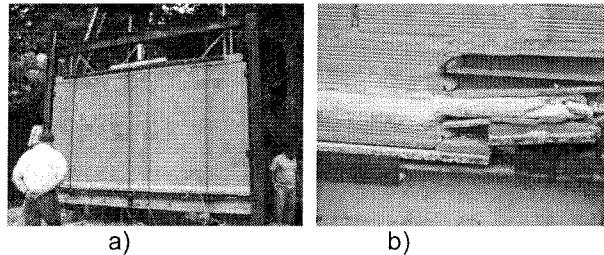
a) General view of the wall before the test; b) Smashing rupture of the vertical septum on the first level of bricks
